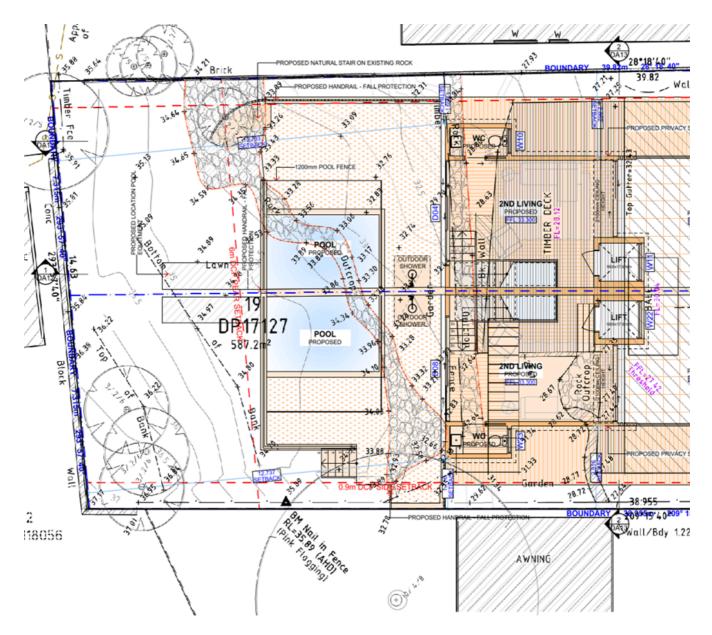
Second Floor Plan with Survey overlay. Note location of the rock formation through the levelled rear yard.
